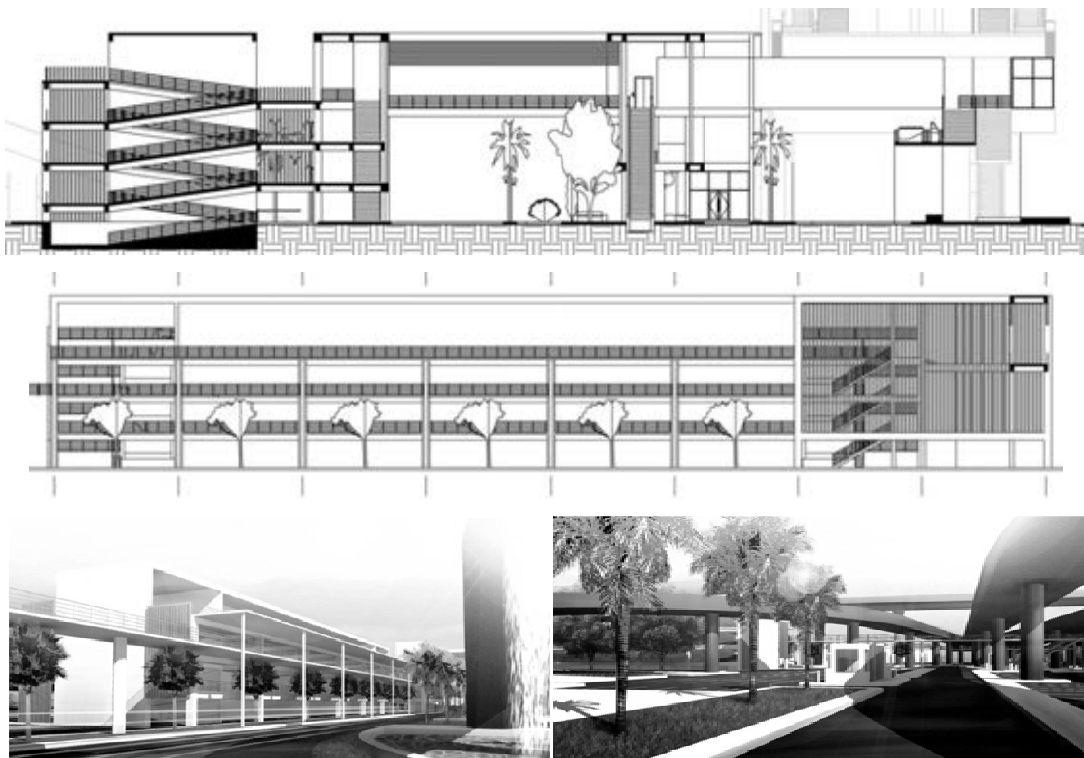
Parking building for *Lat Krabang* ARL station: top: section, middle: elevation, bottom: perspective of parking building (left) and access gate to parking building (right)
